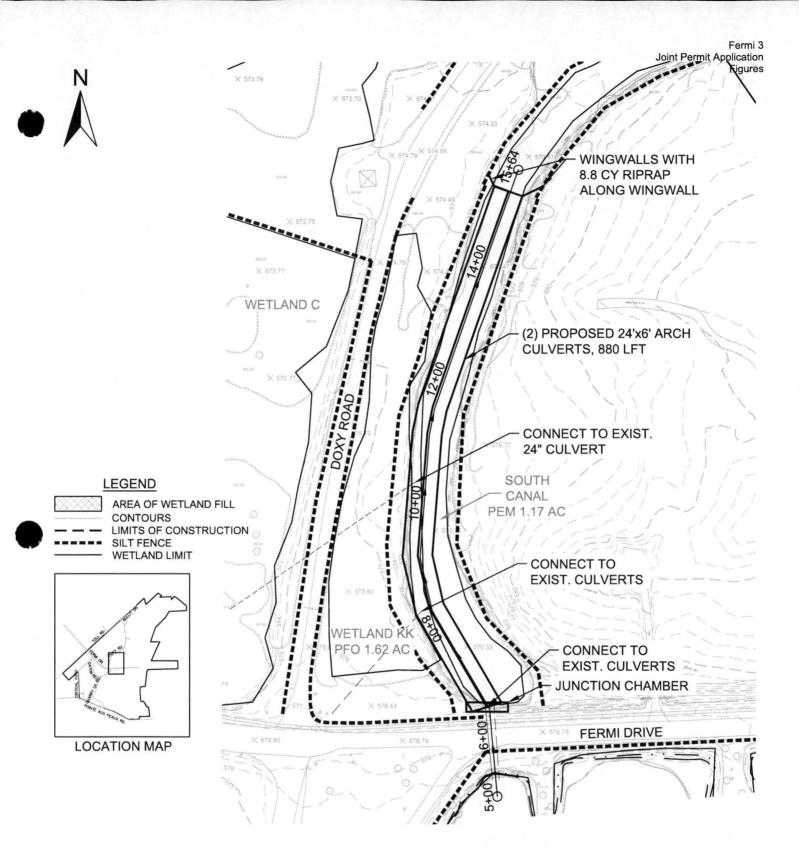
A CONSTRUCTION AREA 5 PLAN VIEW
